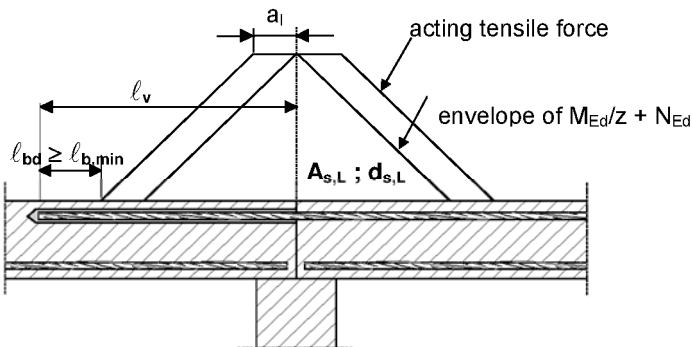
Anchoring of reinforcement to cover the line of acting tensile force
